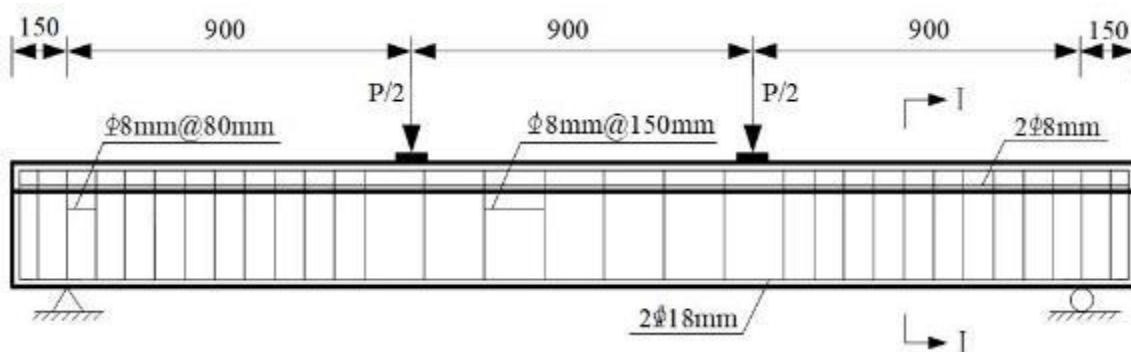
Longitudinal section size and reinforcement (unit: mm)
